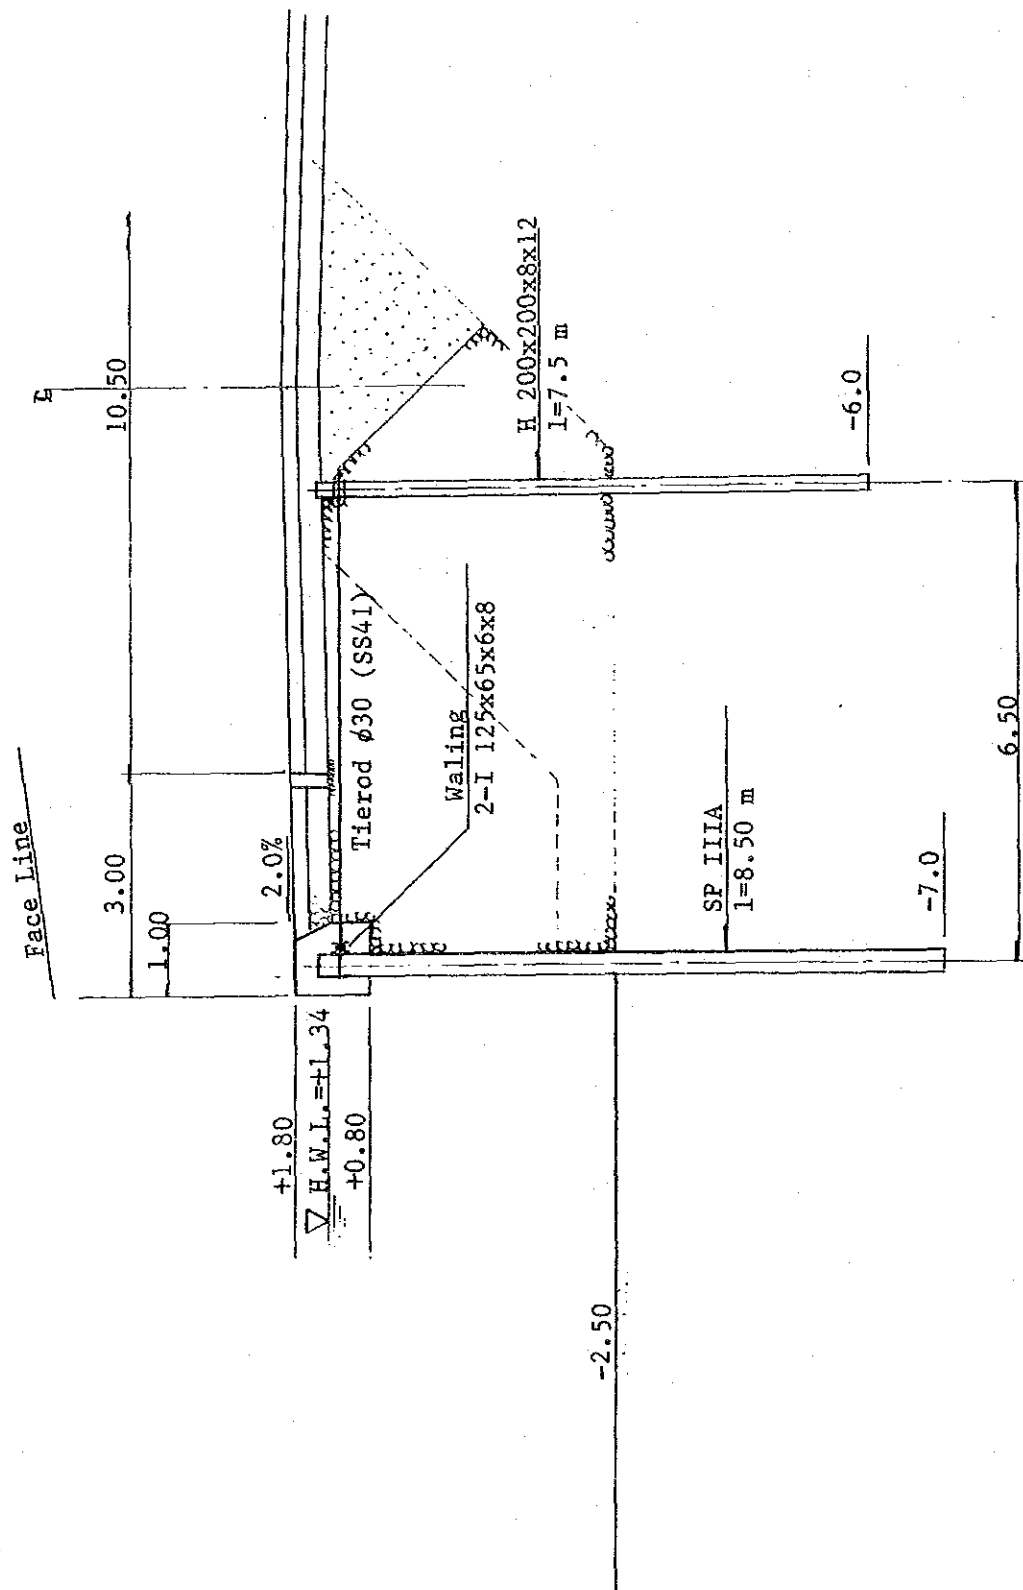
Typical Section of South Coast : Alternative Quaywall (S=1:100)
